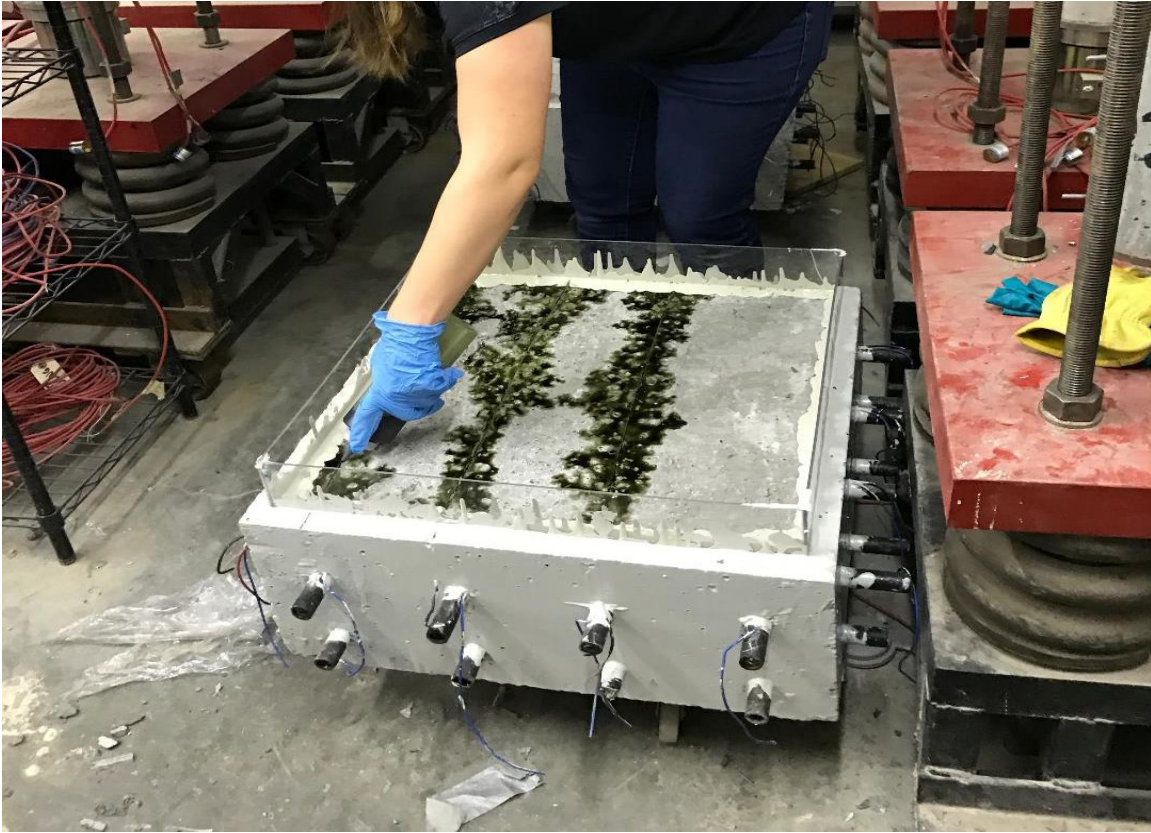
Applying the Concrete Sealant on the Reinforced Concrete Slabs
